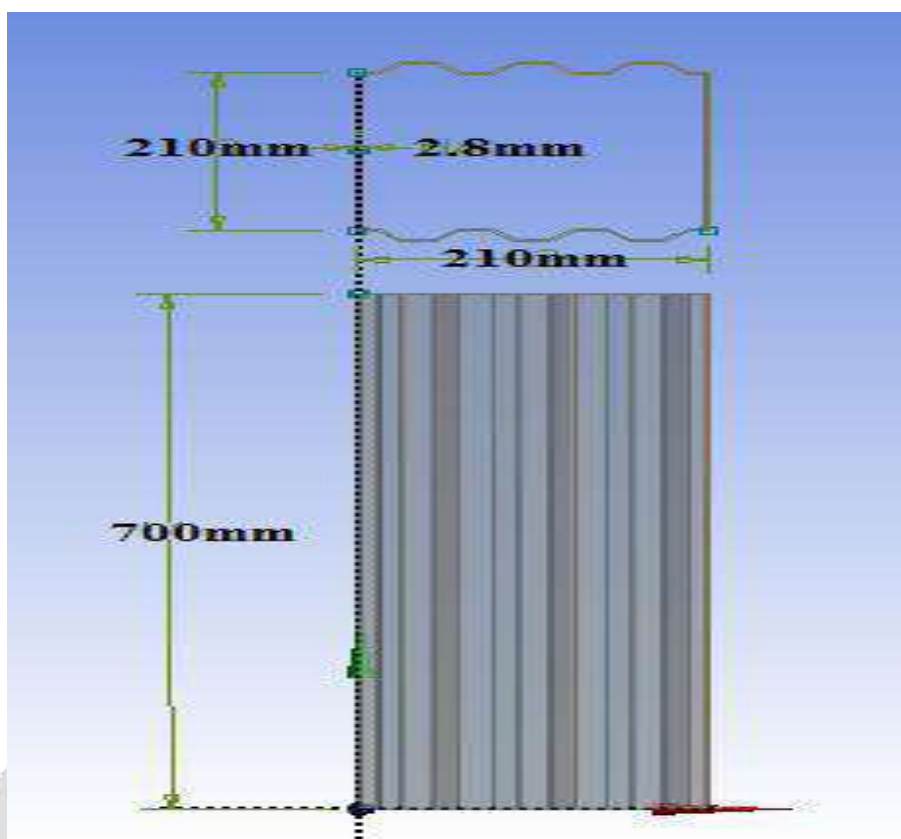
Two sides corrugated 2 side plane column (TCC) dimensions
